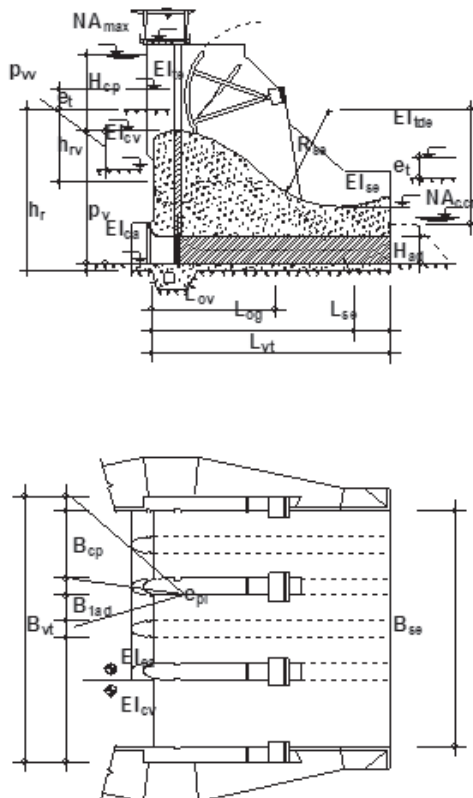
Typical cross-section and plan of a gated spillway with a high ogee crest and a ski jump.
